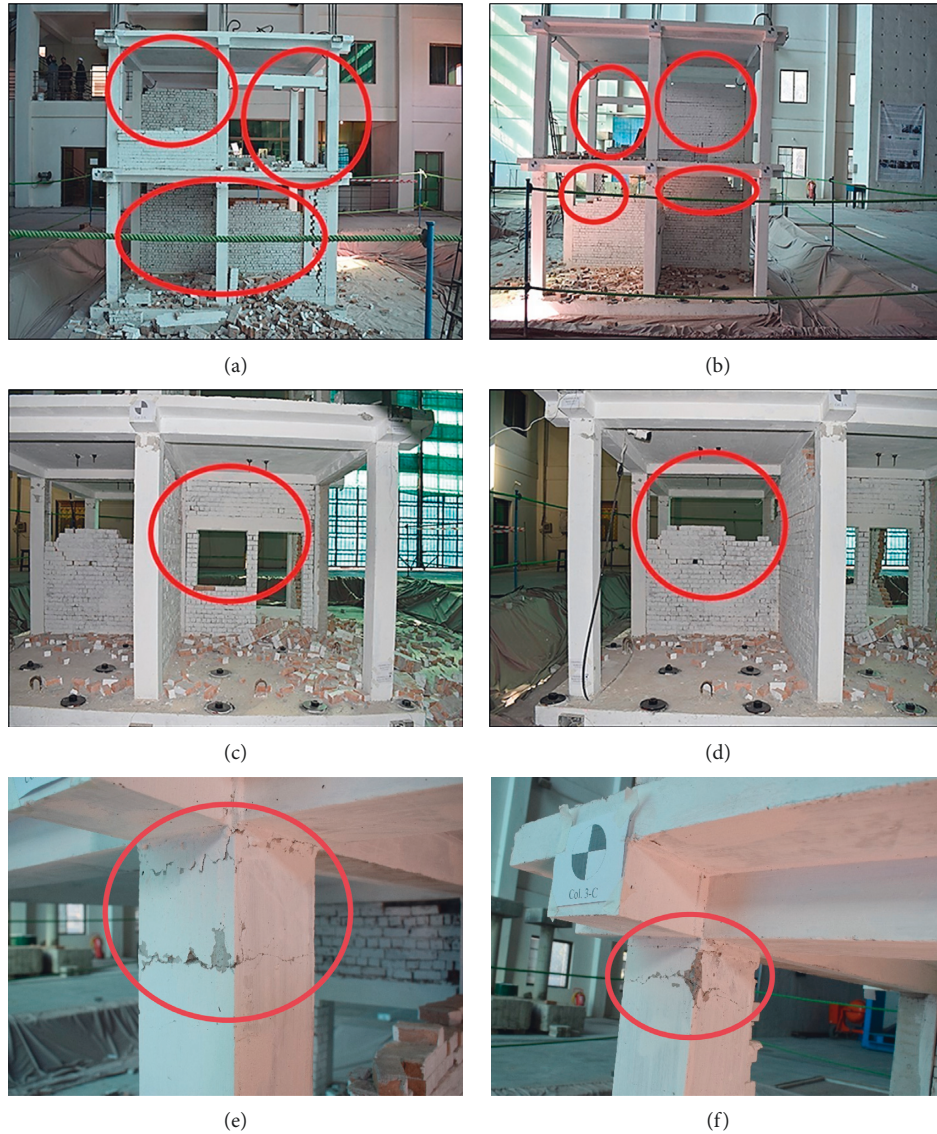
Damage observations of URM walls after Test Run-3. (a) West face of the test specimen. (b) East face of the test specimen. (c) South face west-side infilled frame. (d) South face east-side infilled frame. (e) Crack at the top of the exterior column. (f) Crack at the top of the exterior column.
